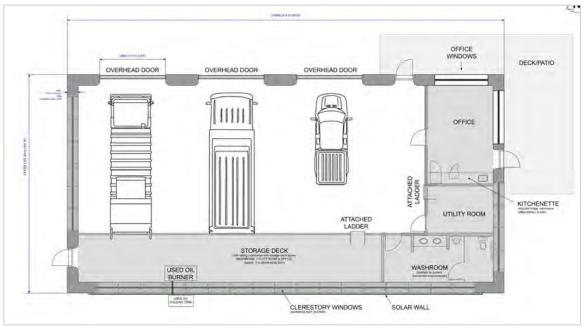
Nominal Dunnottar new Public Works Building layout³⁷
